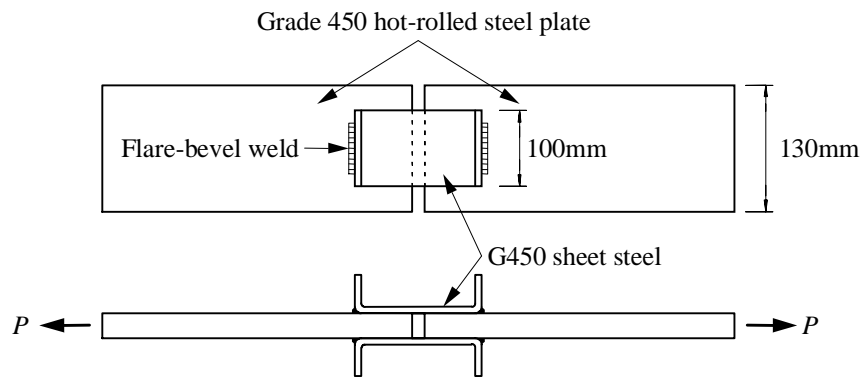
Double-lap transverse flare-bevel welded connection specimen
